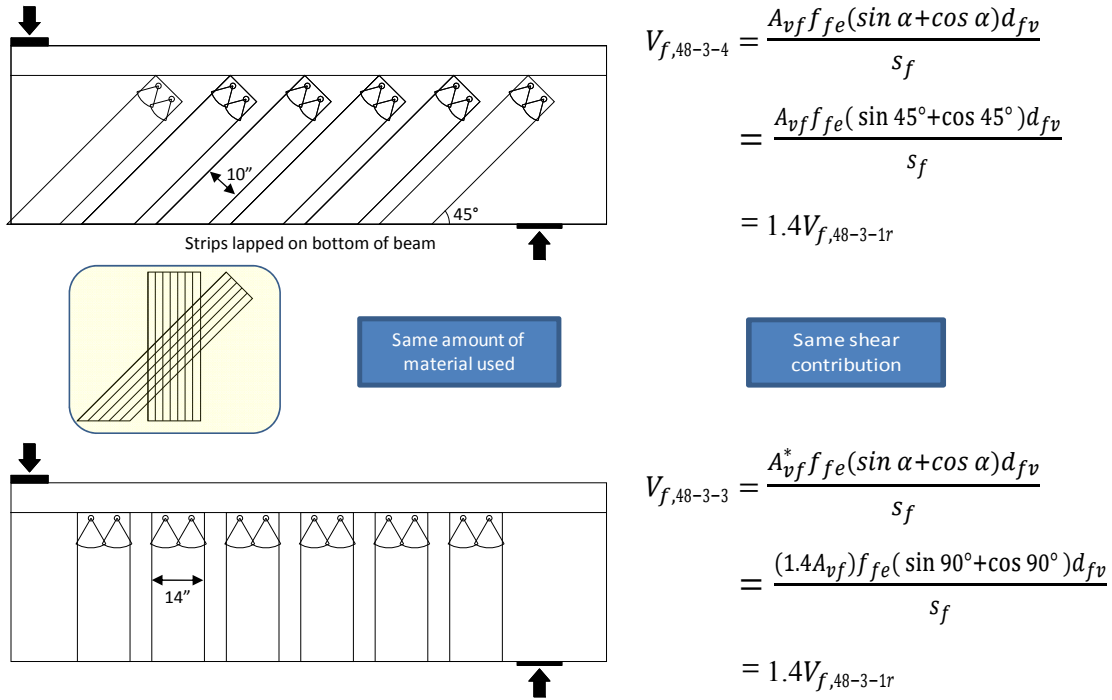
Typical Reinforcement layouts for test 1~4 in 48 in. beams
